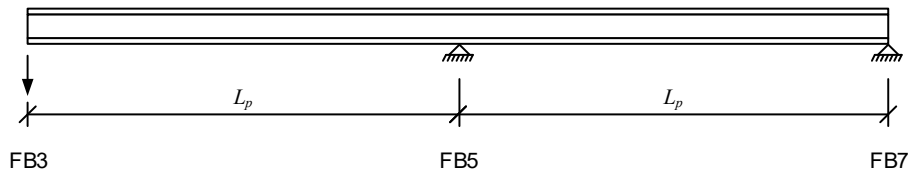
Two-Span Continuous Stringer Supporting a Floor Beam in an End-Loaded Configuration
